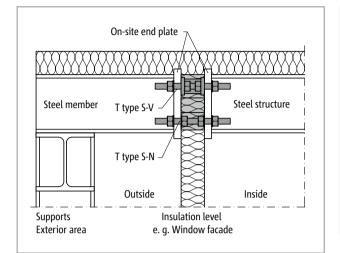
Schöck Isokorb® T Type S for thermal separation within the structural system
